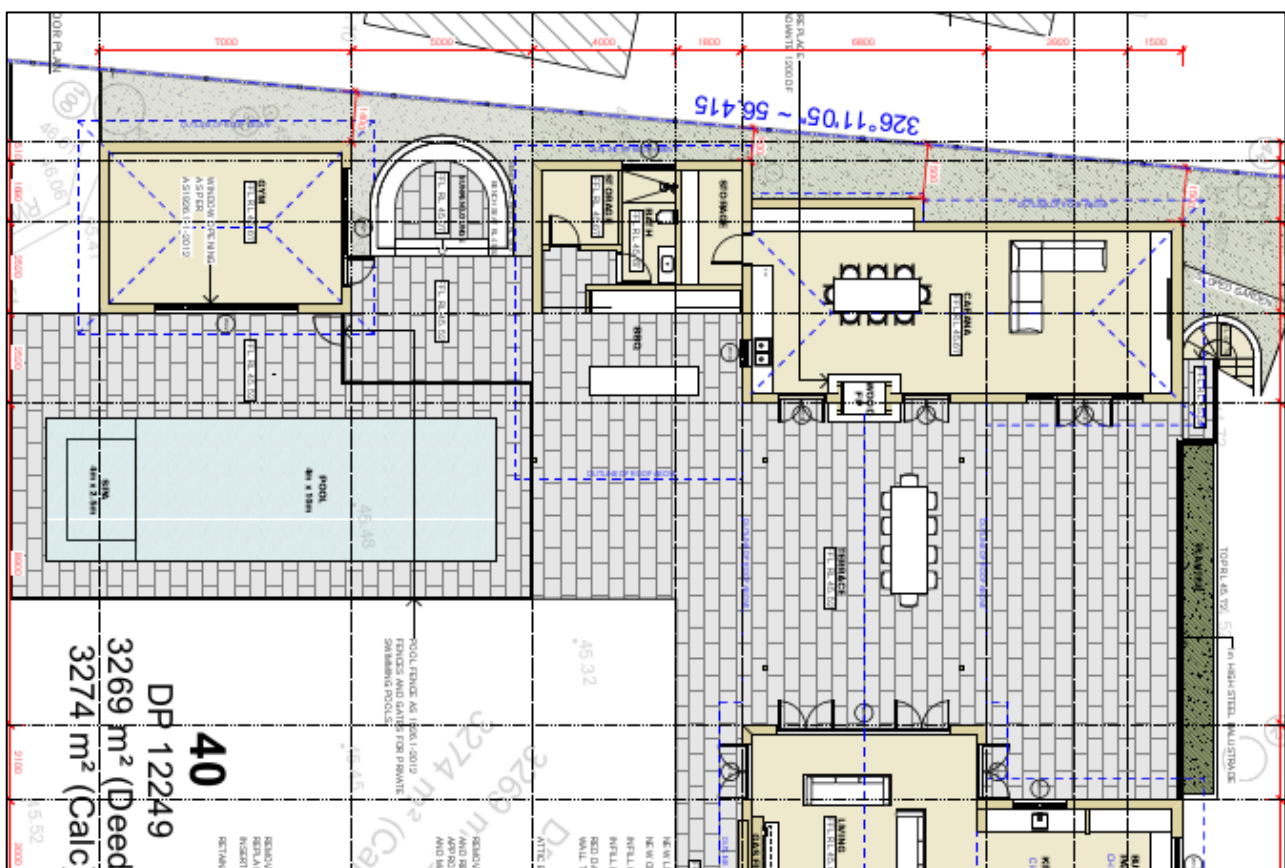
Extract of the applicant's submitted revised Ground Floor Plan
